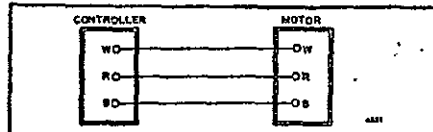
Typical modulating motor-controller wiring hookup for heating application.
